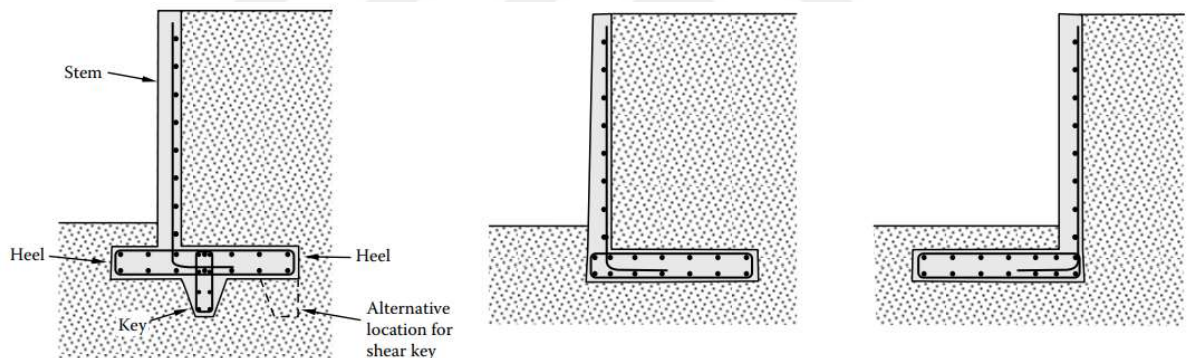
Cross-sections of the typical cantilever walls [6].
